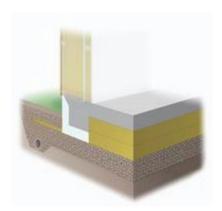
A ground slab can be insulated under the concrete, above the concrete, or both under and above the concrete. This picture shows the insulation (yellow) under the concrete.
